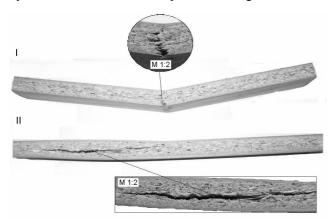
Specimen failure scheme: I – specimen failed during fracture of the coating i; II – specimen failed during separation of inner layers
